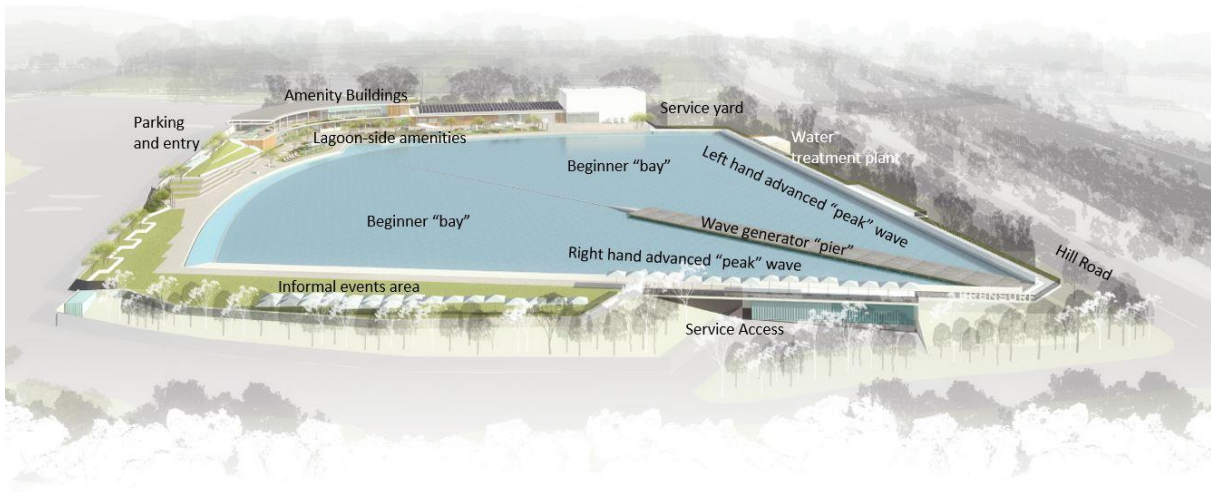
Perspective View of Proposed Development from East (Source: MJA Studio)
